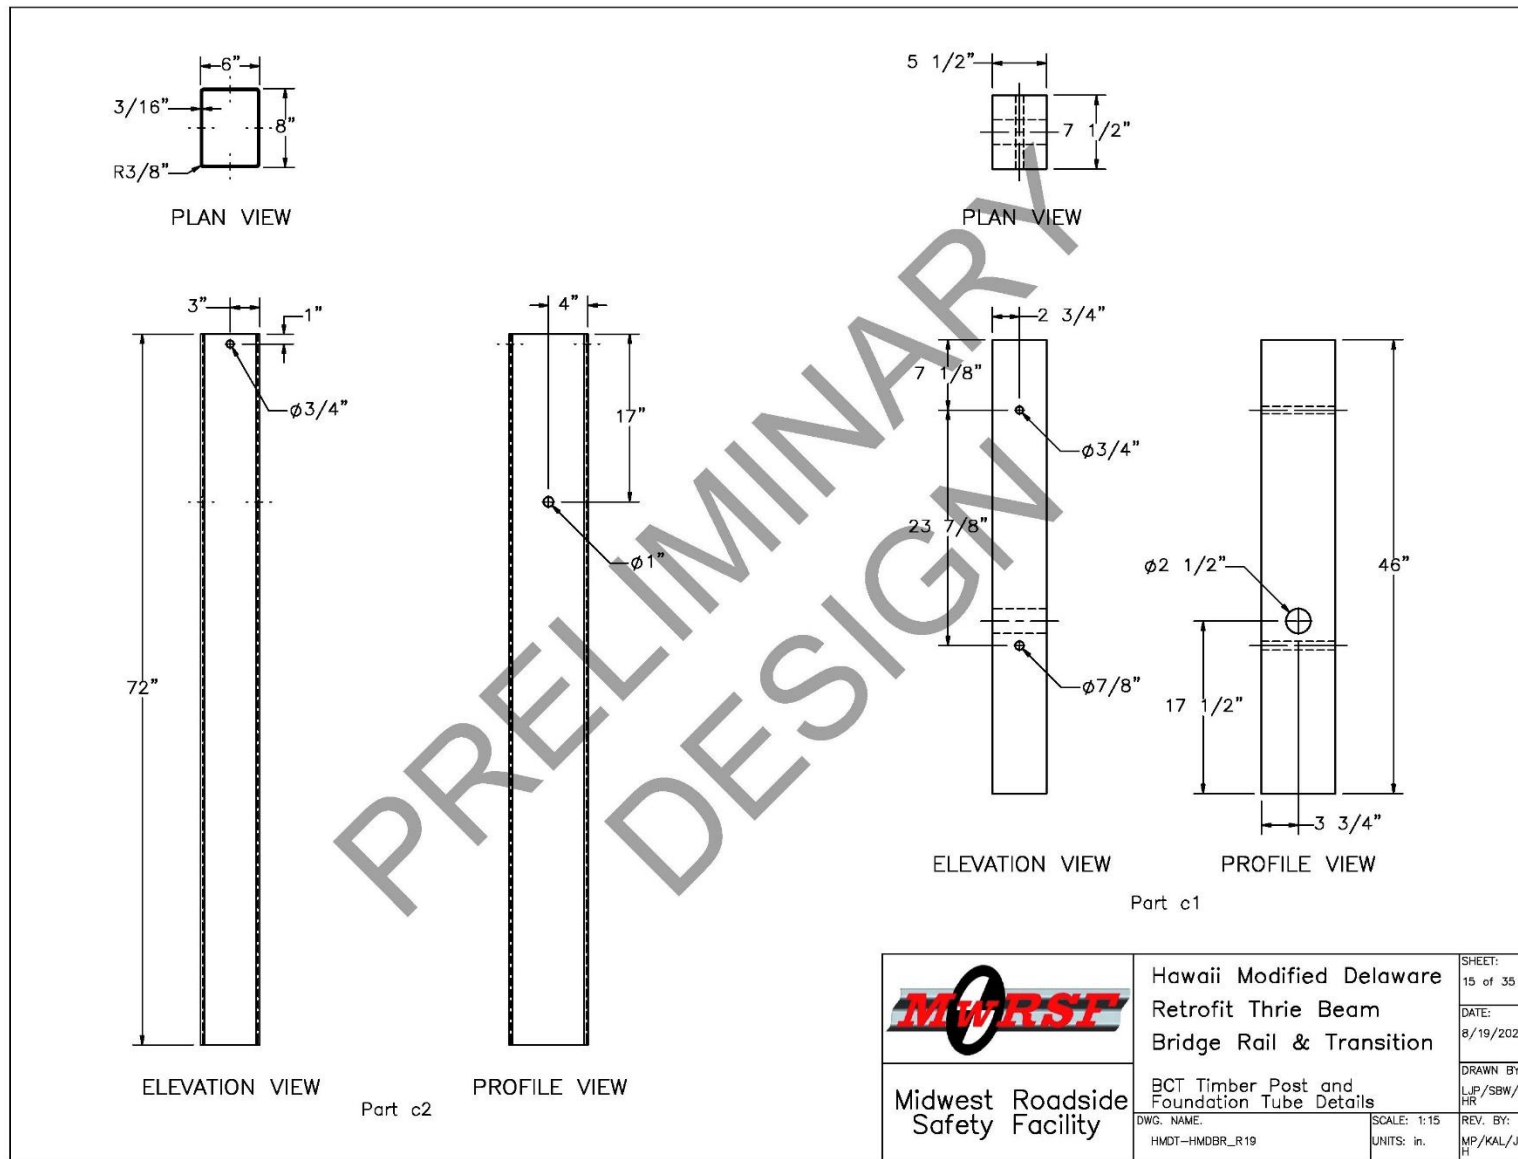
BCT Timber Post and Foundation Tube Details, Test No. HMDT-1
